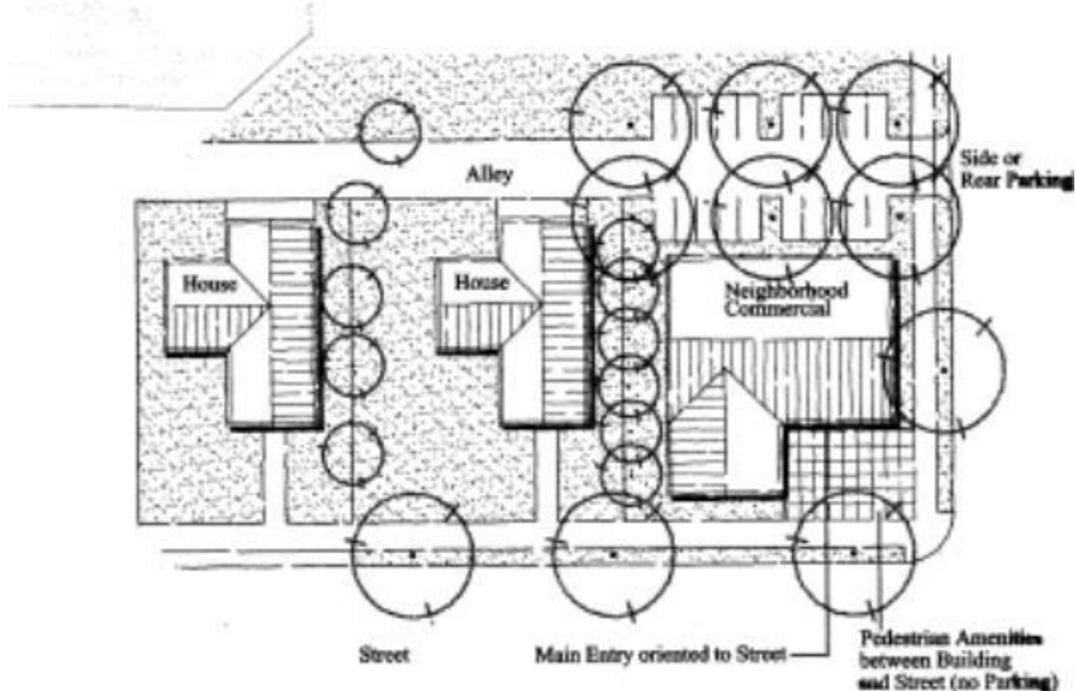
B – Typical Building Orientation (Residential Commercial Building)
